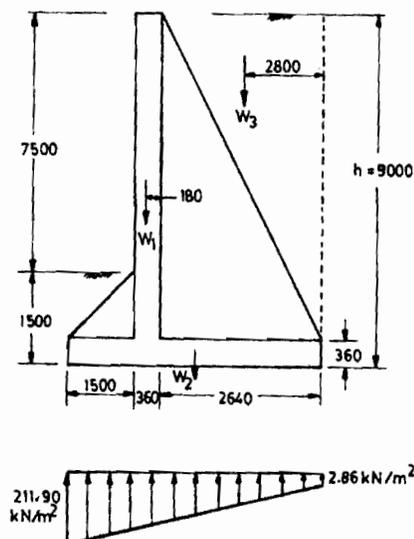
Preliminary Dimensions of Counterfort Retaining Wall and Soil Pressure
